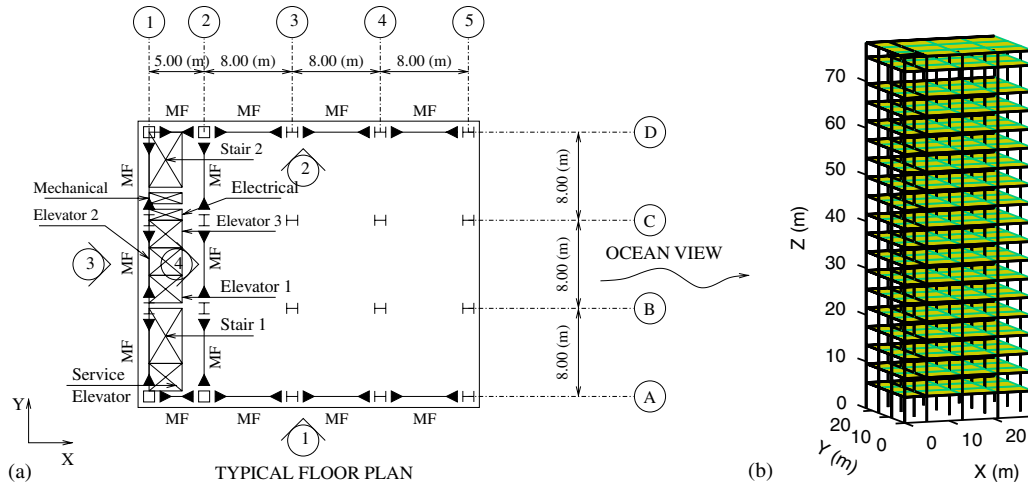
(a) Typical floor plan of buildings B-3 and B-3A; and (b) isometric view of buildings B-3 and B-3A.
